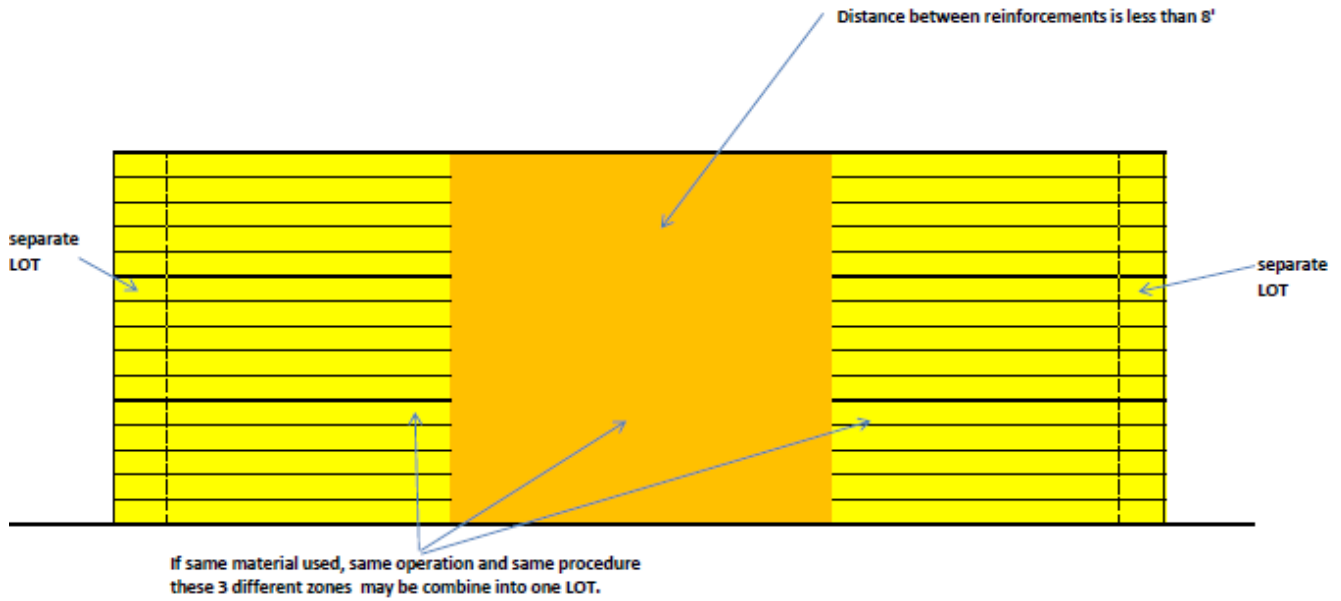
Paralell walls, with a narrow gap between reinforcements
